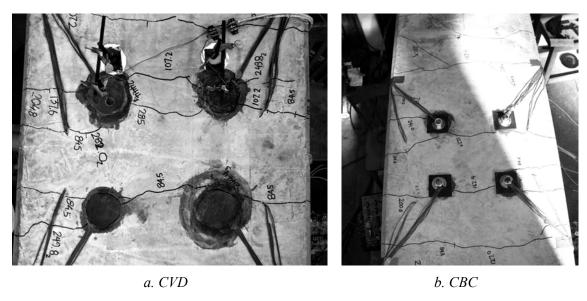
CVD3 and CBC3 Crack Patterns on Cap Top at Factored-Level Load
